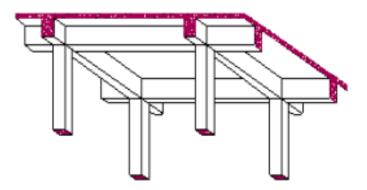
3: Two-Way Solid Slab and Beam (SADAT, 2014)
